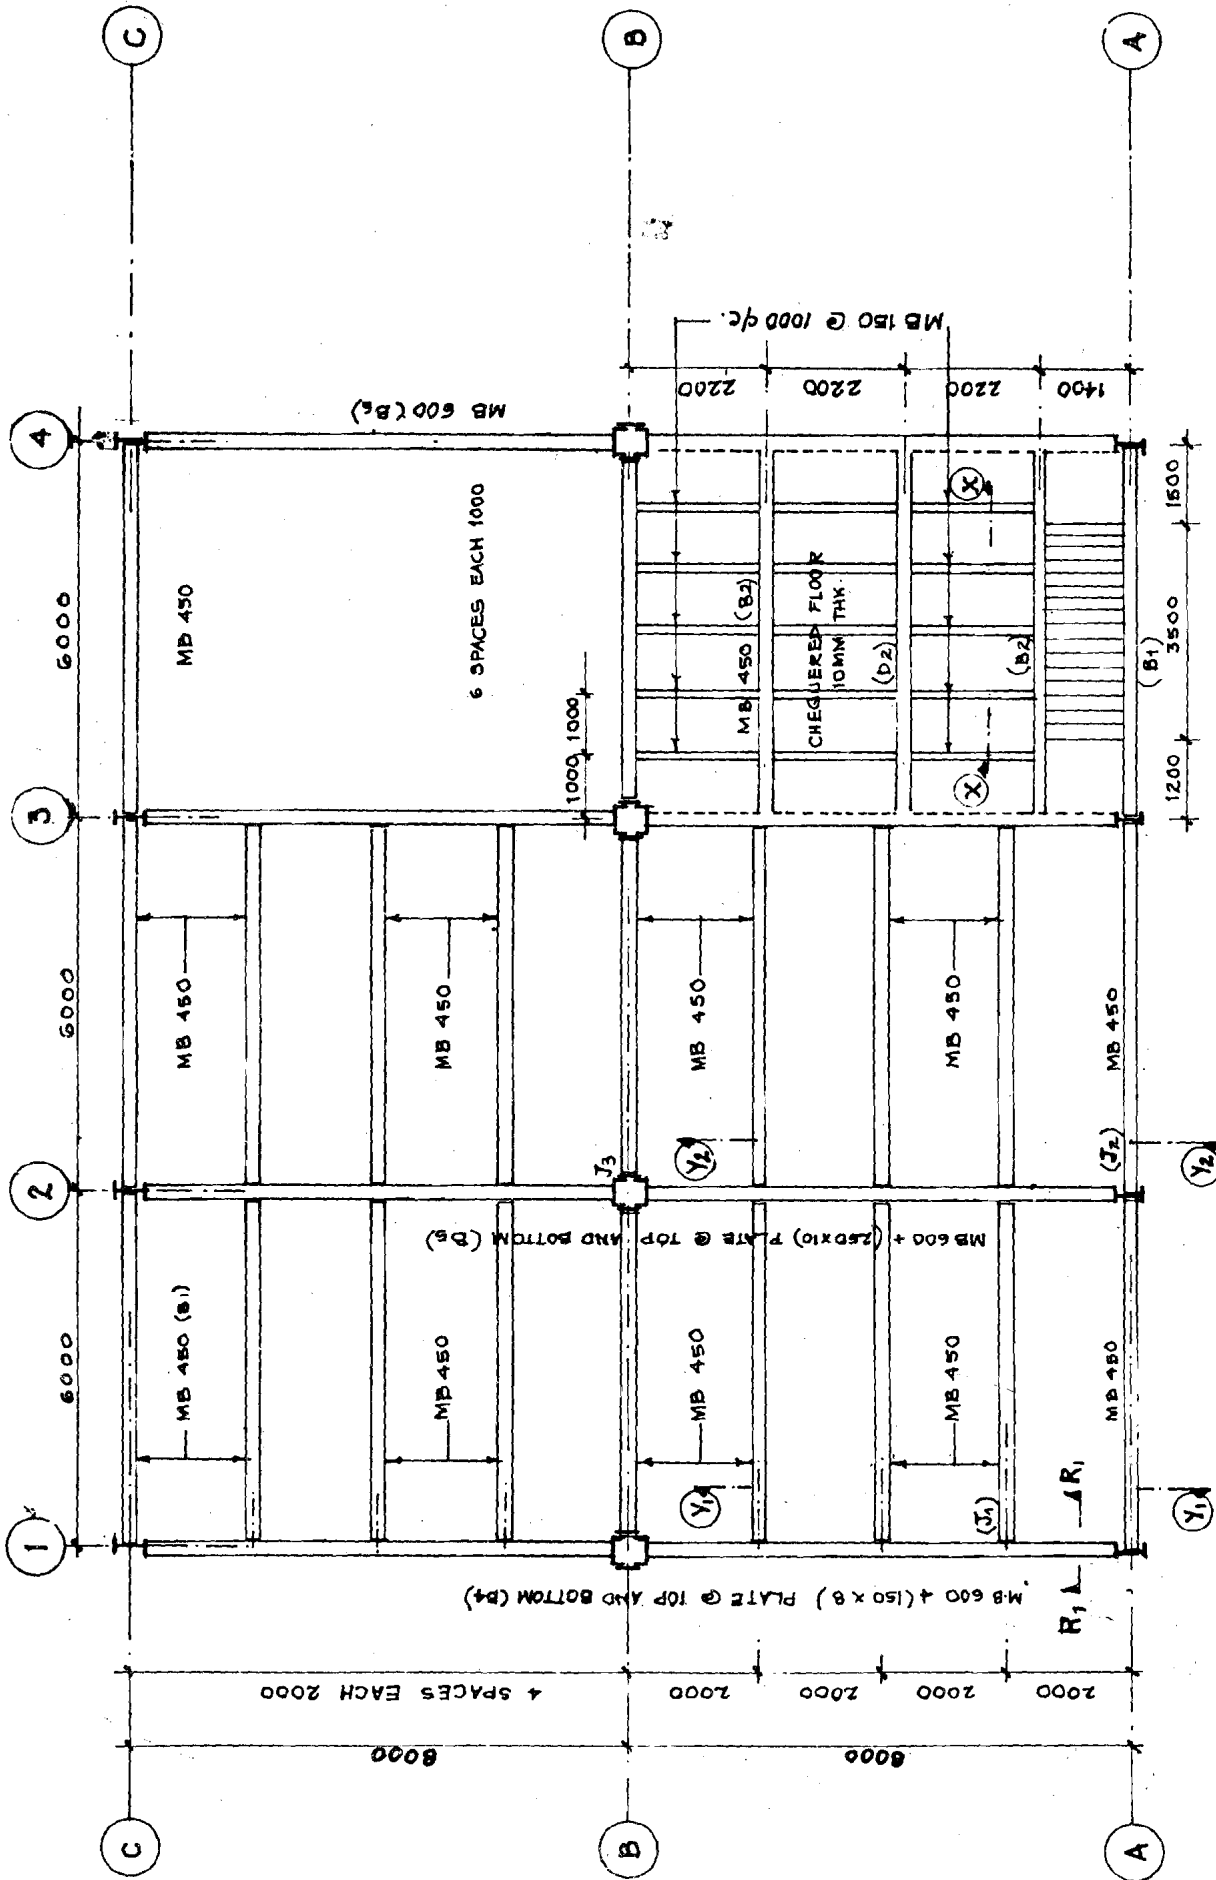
(a) : Layout Plan of Stenctions (Column, Beam, Chequered Plates) & R.C.C Slab at a Typical Floor of Industrial Building.
